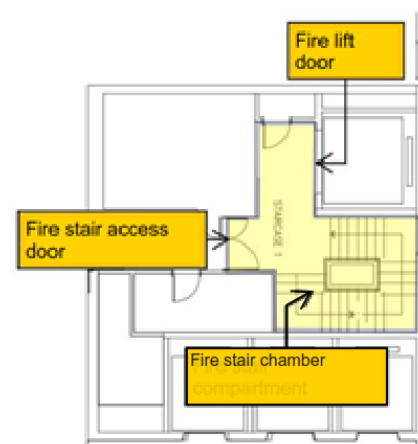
Layout of fire stair chamber in WTC 6 building.
